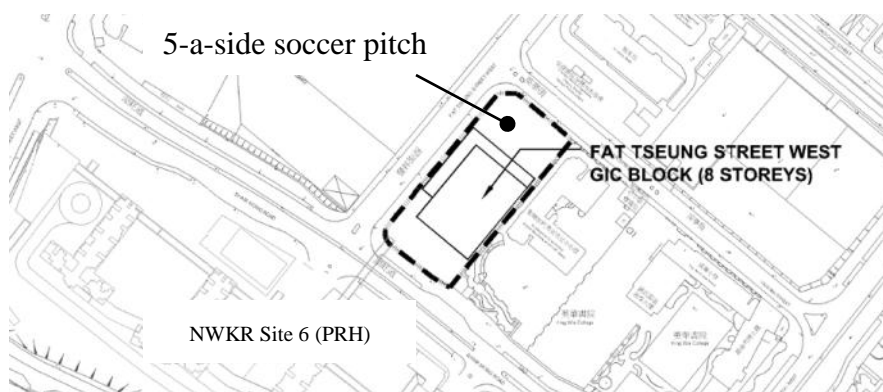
Master layout plan of Baseline Scheme for FTSW Site
